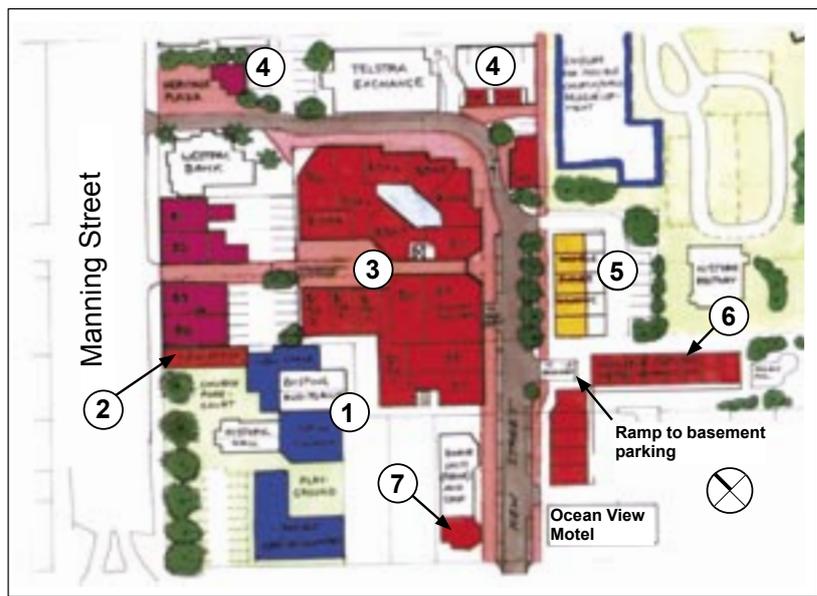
Ground Floor Plan of Church Lane, see next page for upper level plans
